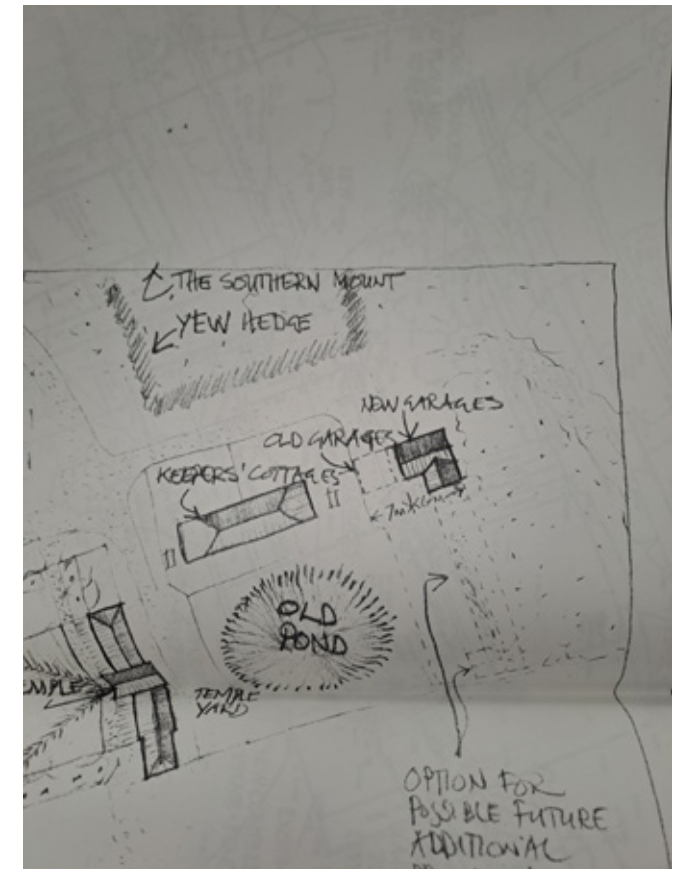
A site plan from the late 1990s or early 2000s showing plans to replace the older garage block with a new L-shaped structure. Single-storey rectangular garages now occupy this position. City of London Corporation, CTU/TEM/5 File 1
